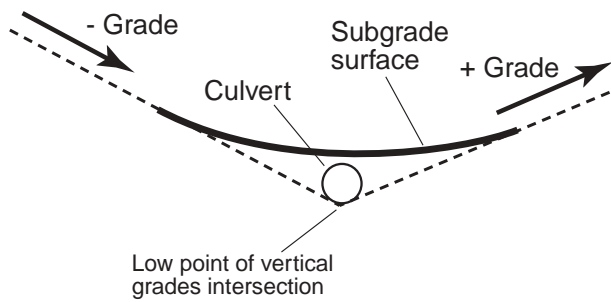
Ditch relief culvert installed at the low point in the ditch line.
